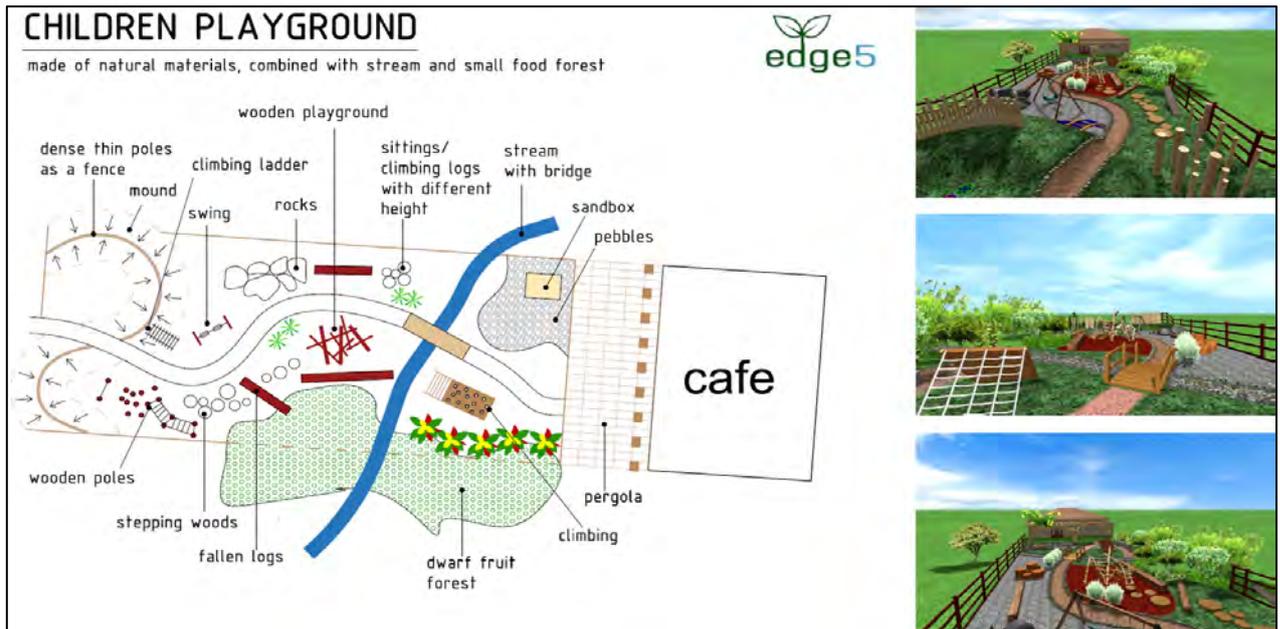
Proposed Childrens playground. Permacultural Plans Attachment 5.
